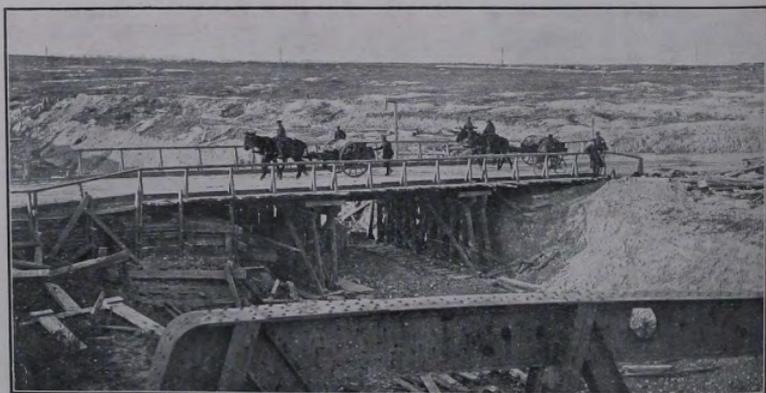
Photograph XXIV.—K. 84-ft. 0-in. length of Inglis Rectangular Type at La Motte, April, 1918; also to the right is shown K1, Replacement Bridge, consisting of 2 21-ft. 6-in. and 2 16-ft. 0-in. Spans, Mark II. N.14.d.1.3. View shows Inglis Bridge being dismantled. 4th Army.
